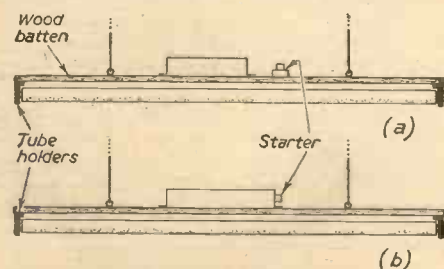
Simple fittings made by mounting the ballast, starter and tube on a wood batten.
